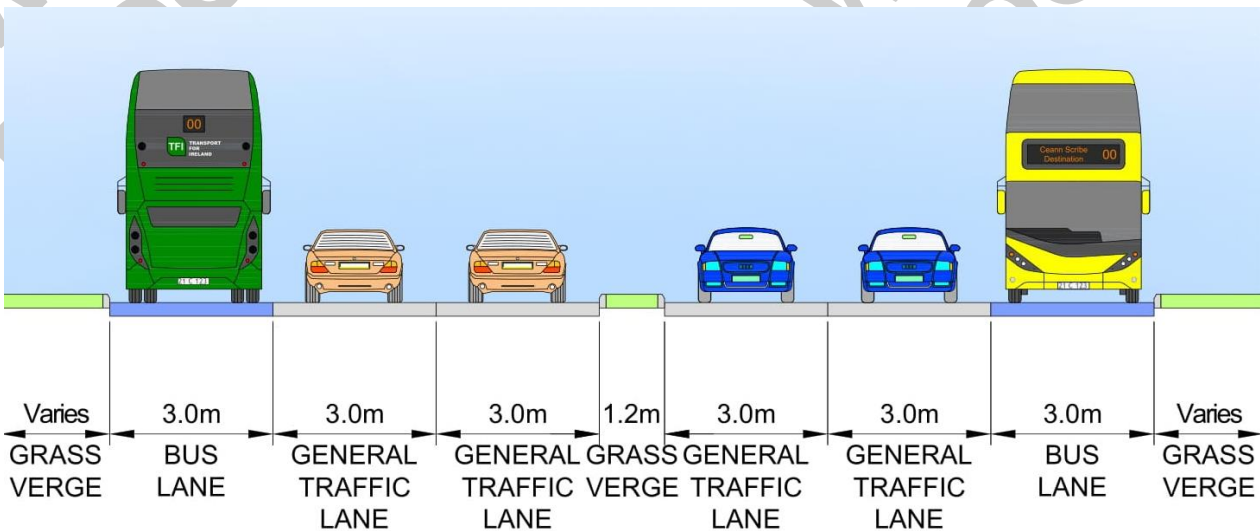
Section 2, Proposed Option 2 – Cross Section A-A
